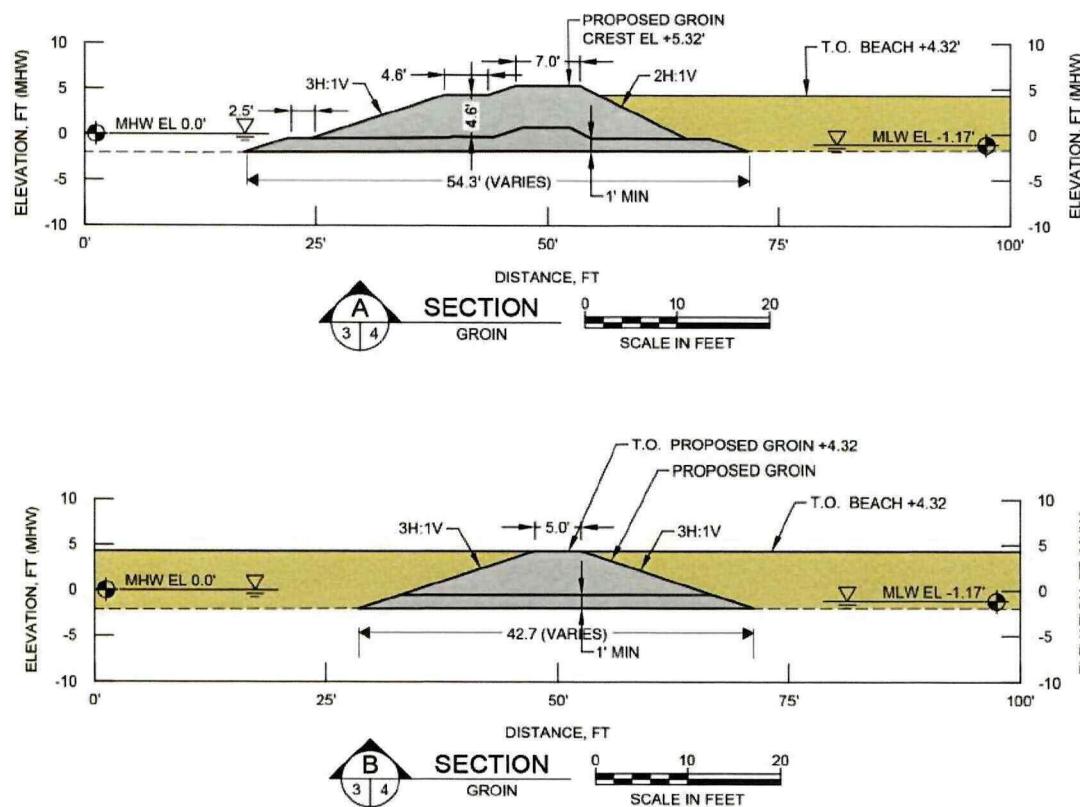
B. Cross sections of the proposed beach nourishment areas and protective structures.
